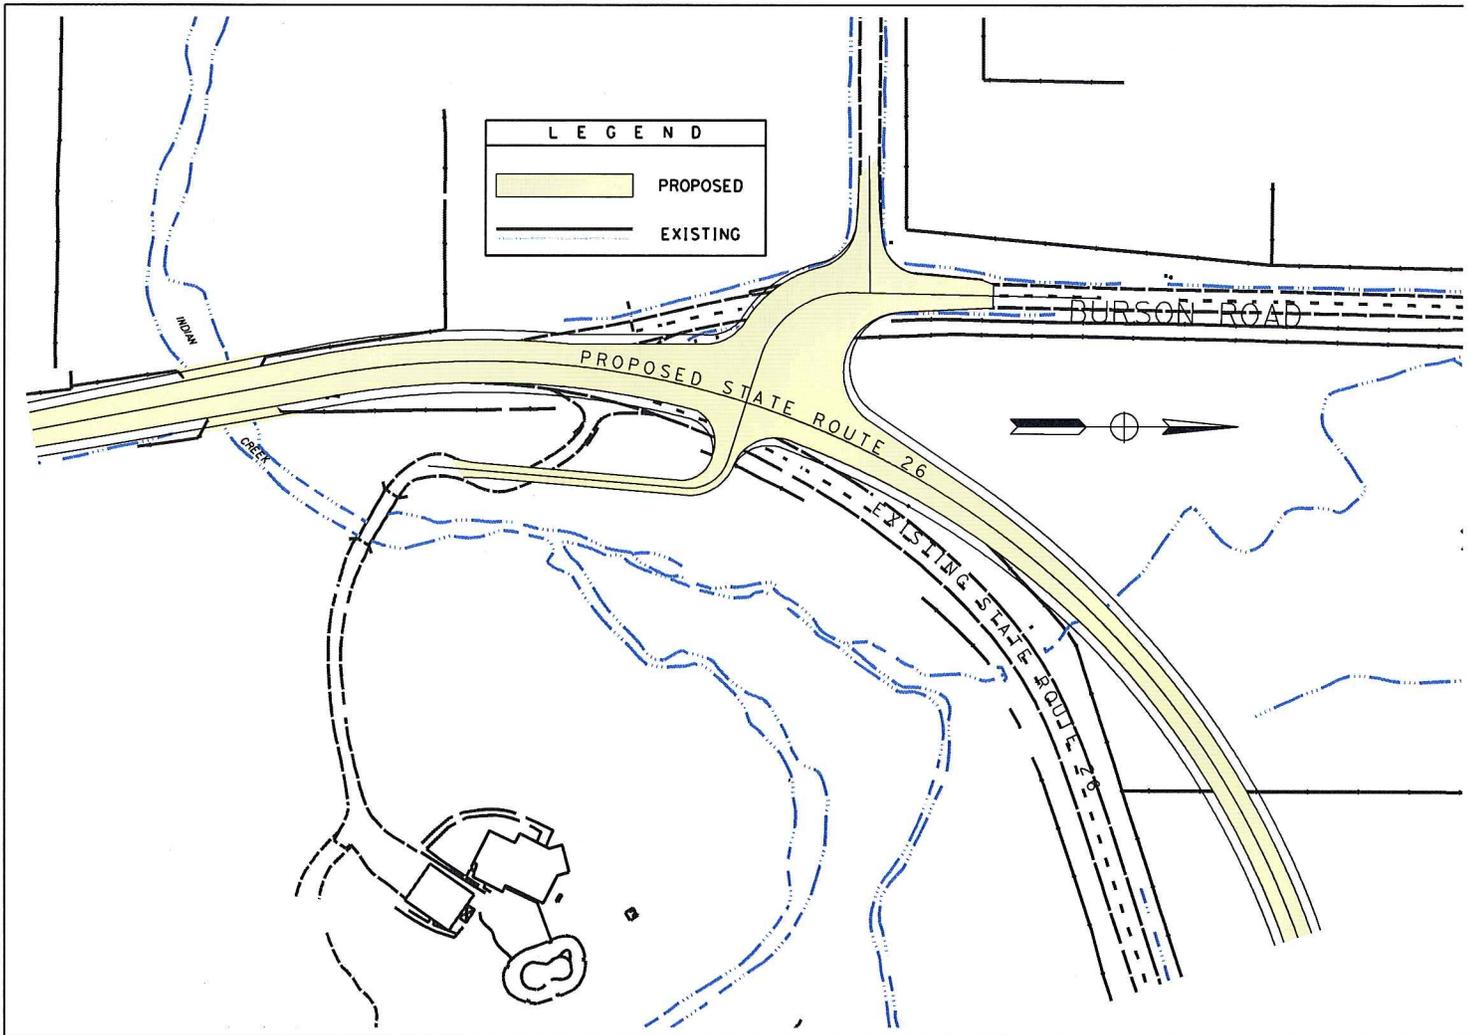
Proposed State Route 26/Burson Road Intersection
